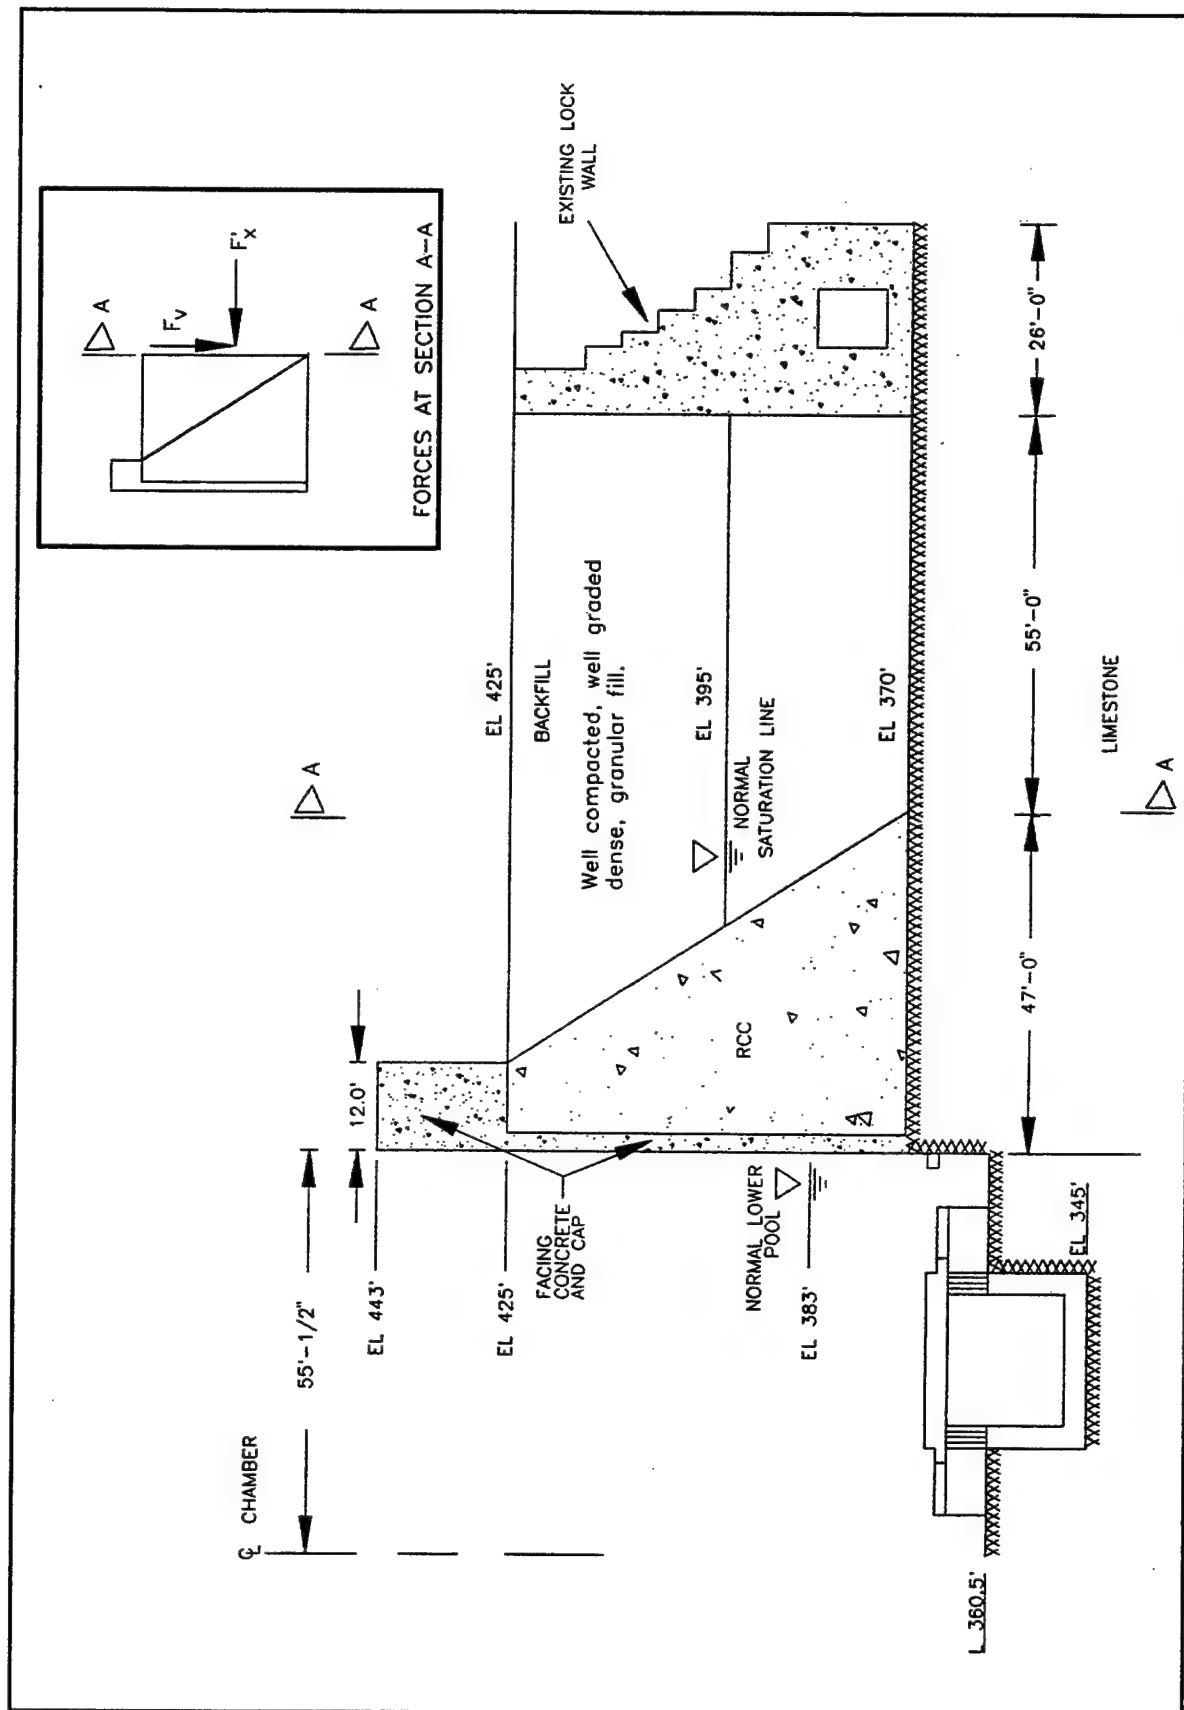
Typical section, north wall of new RCC McAlpine Lock (adapted from Ebeling and Wahl 1997) (1 ft = 0.305 m)
